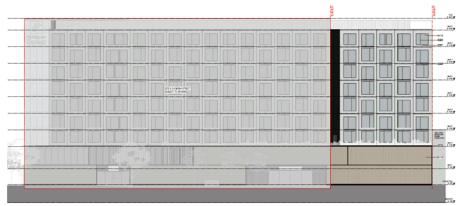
Plan submitted with DA-2018/319 demonstrating the proposed addition at 10-12 Sarah Street.
